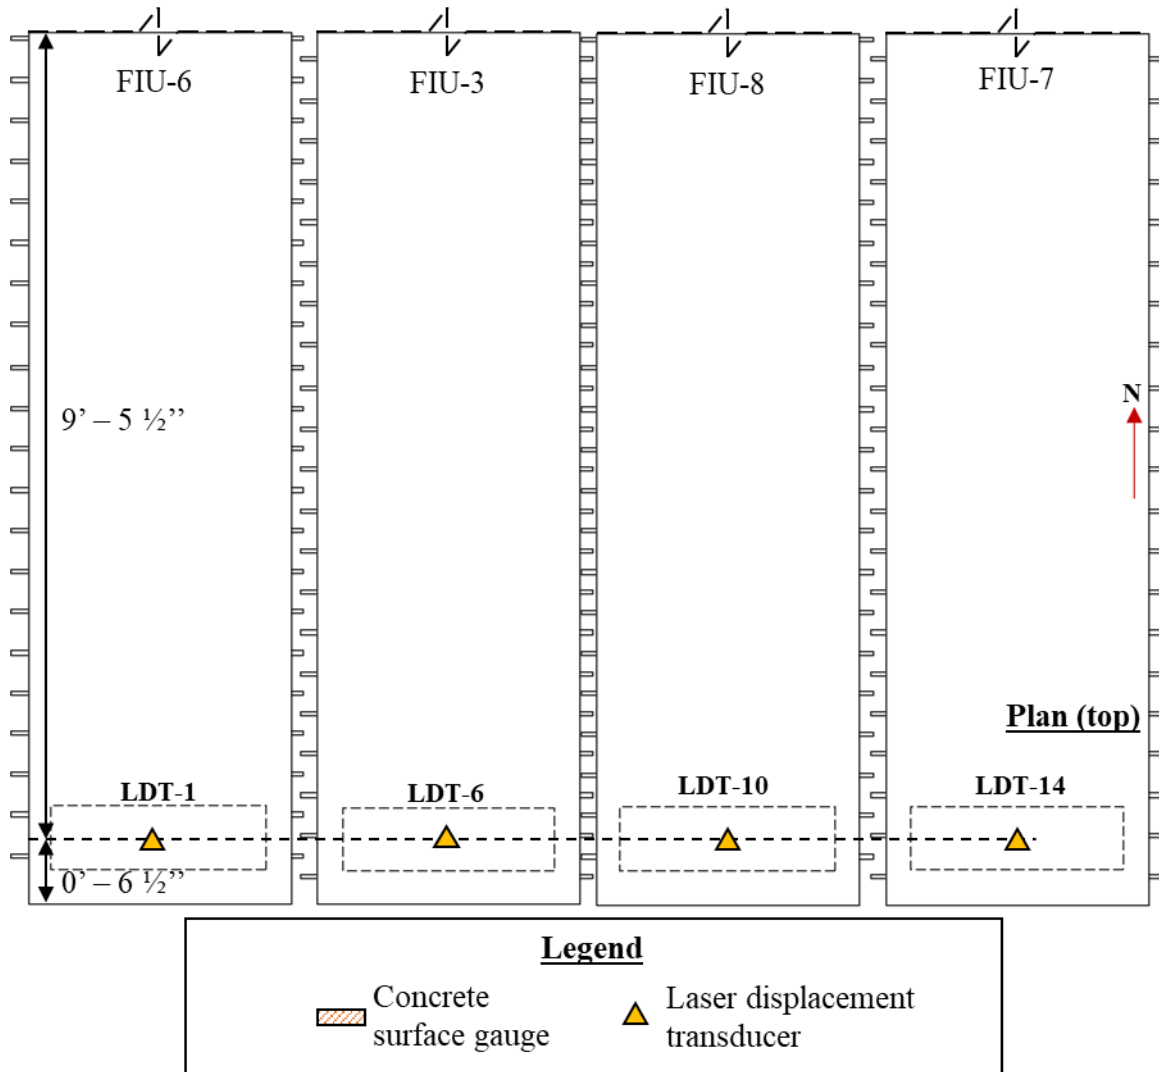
Four-beam stiffness and camber leveling testing instrumentation toward south support
